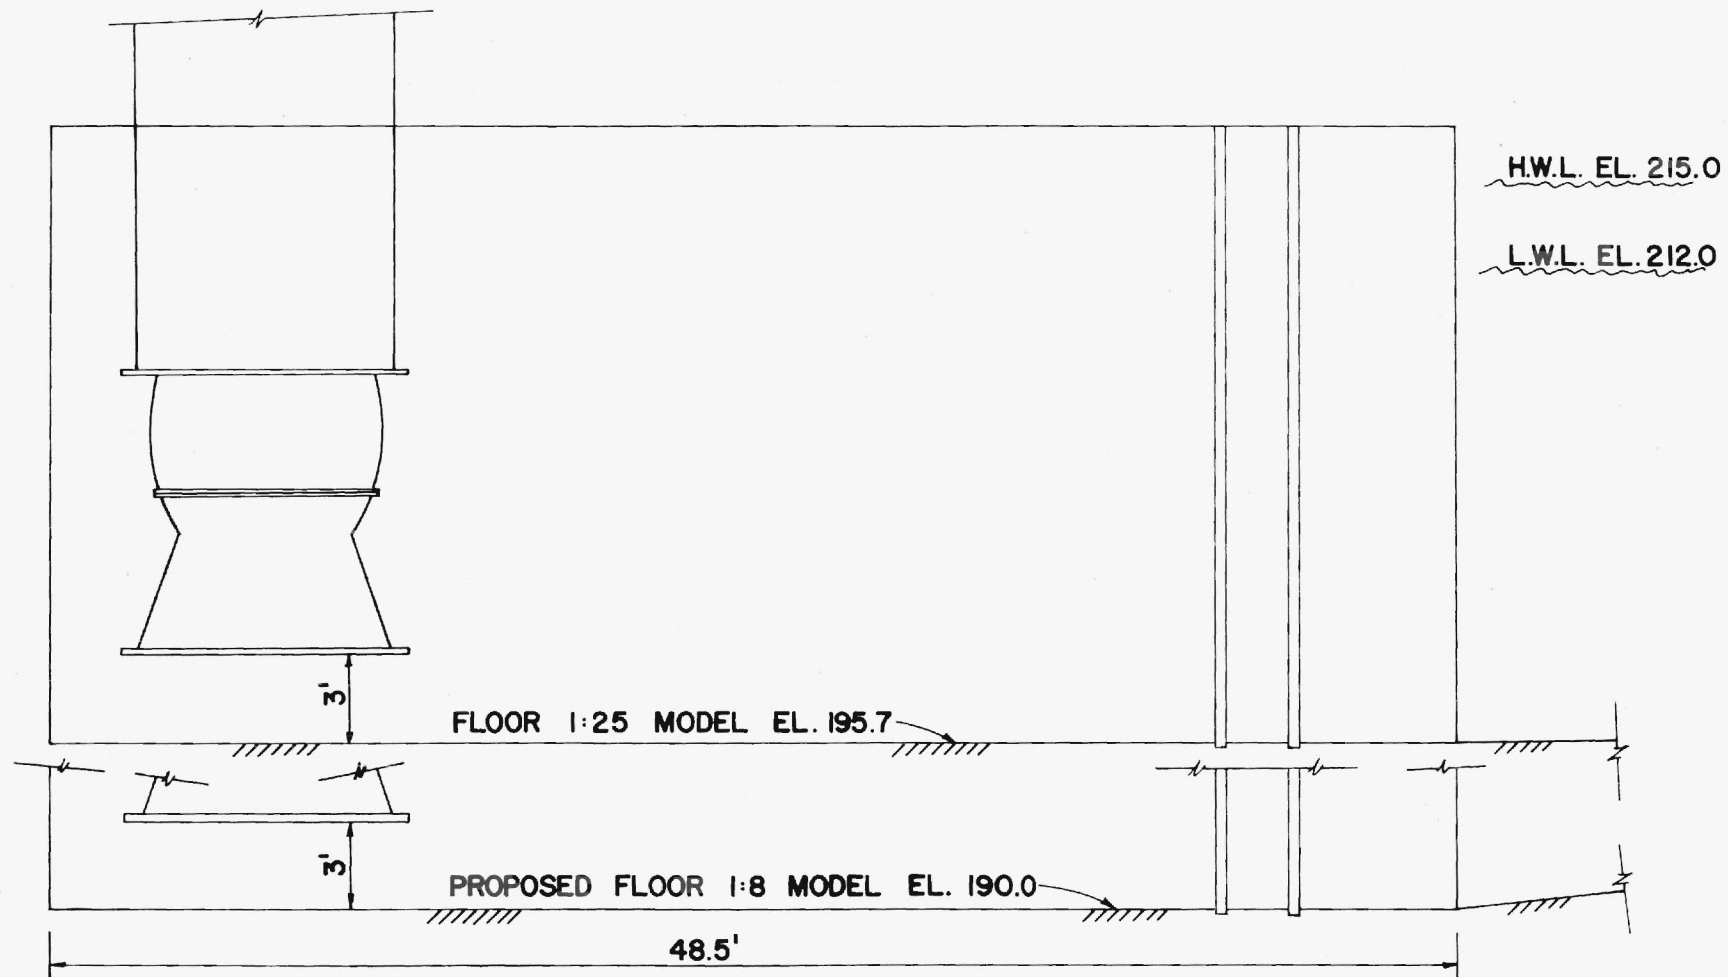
ELEVATION SKETCH OF PUMP INTAKE STRUCTURE
